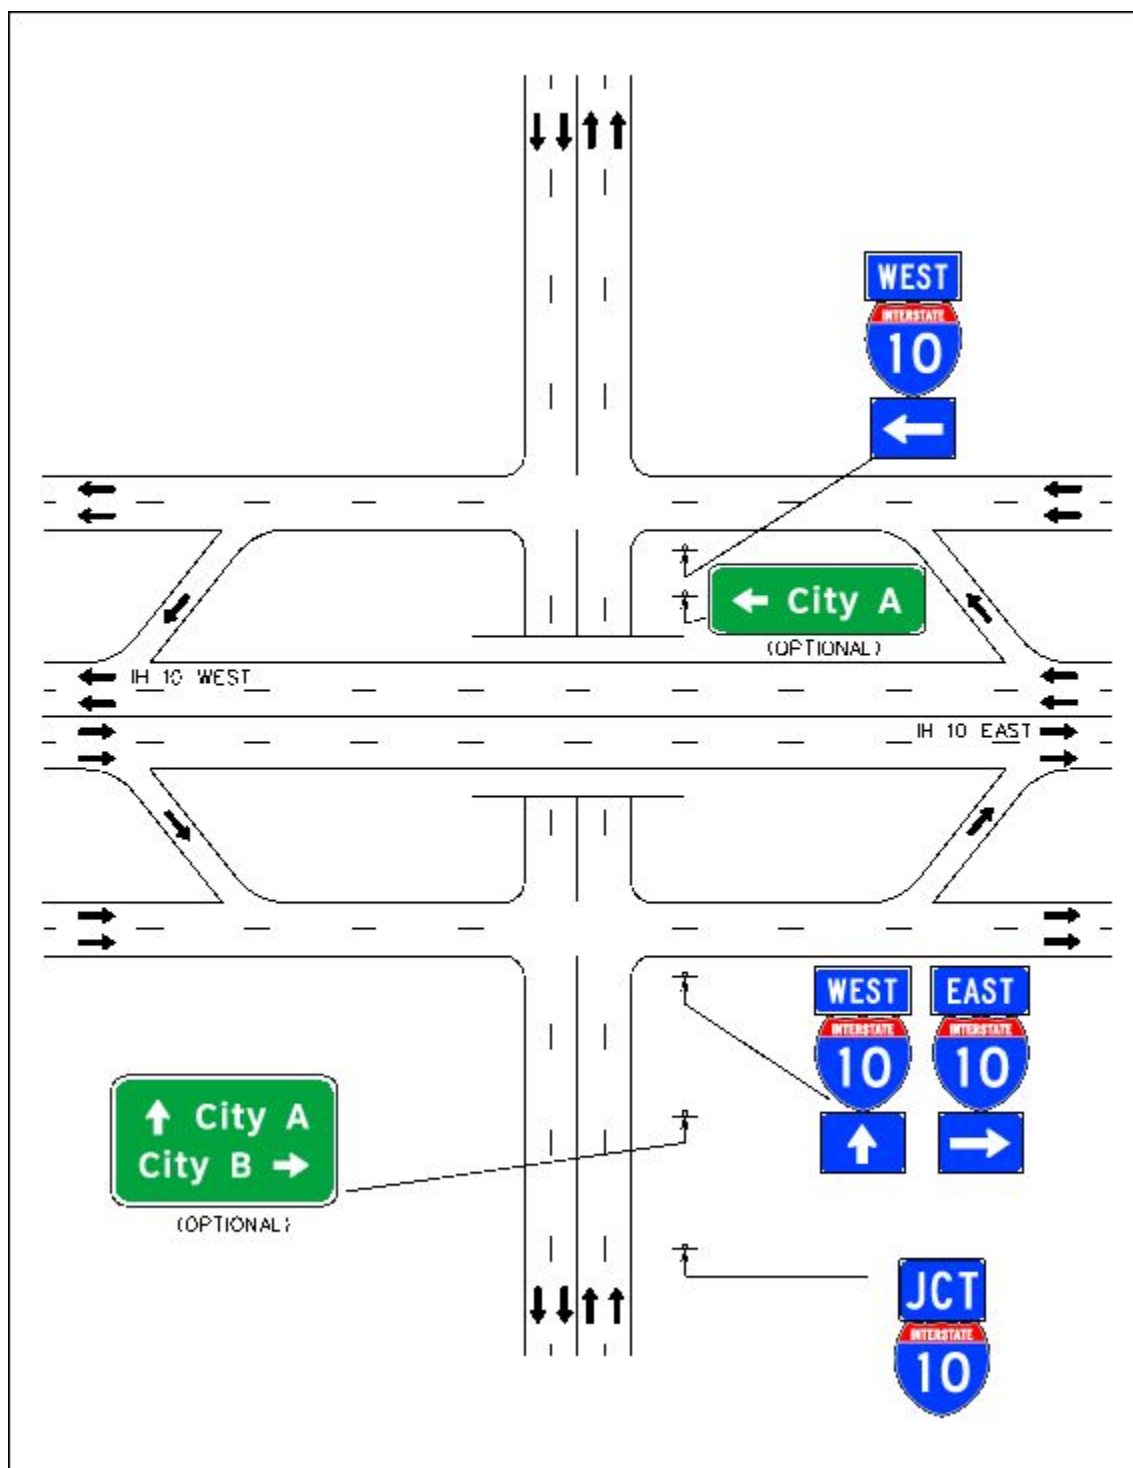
Cross-street route signing for left-direction entrance ramp located on the far-left frontage road and right-direction entrance ramp located on near-right frontage road.
